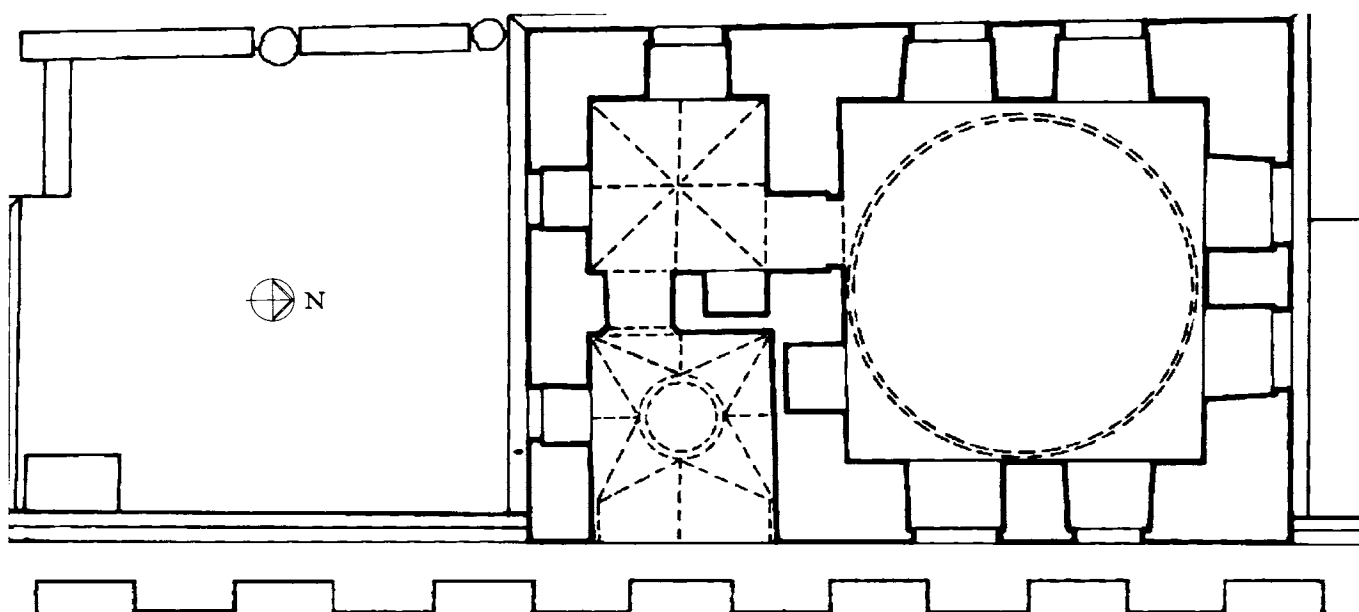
Khalwat Bairam Pasha, ground plan.
